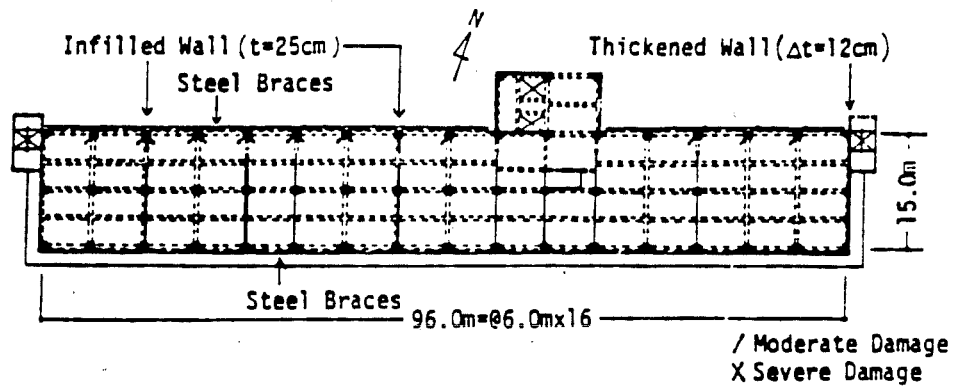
Sendai School, Japan; plan and elevation [5]
